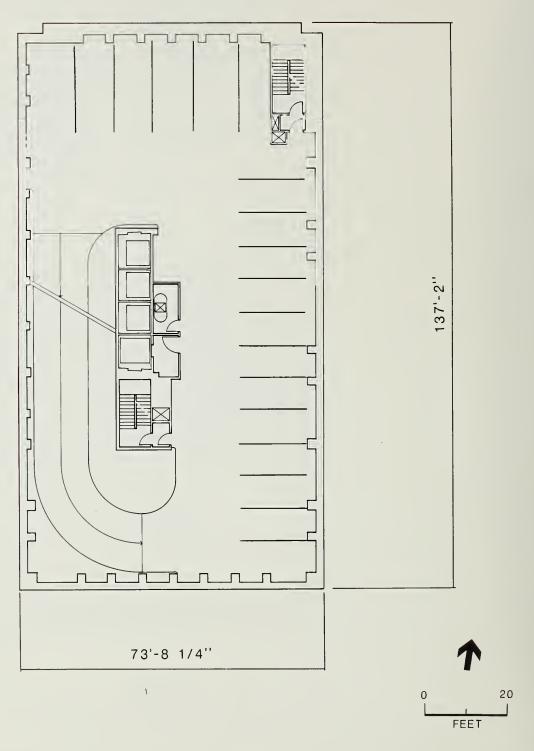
235 PINE TYPICAL PARKING LEVEL PLAN
